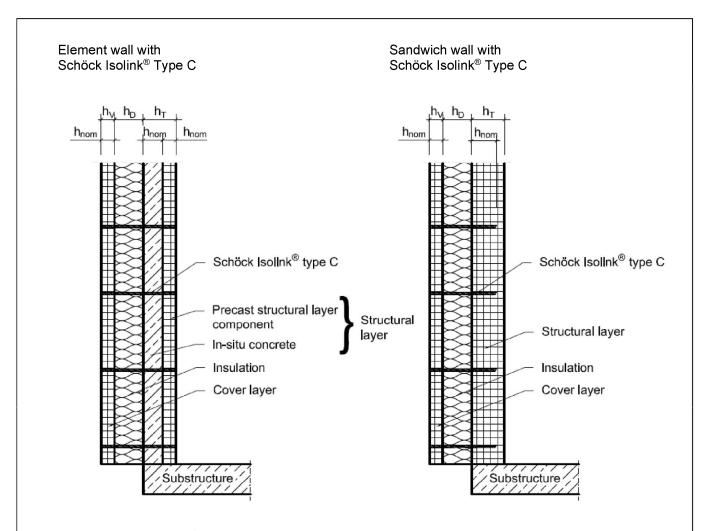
Schöck Isolink[®] type C Wall with non-supported cover layer
